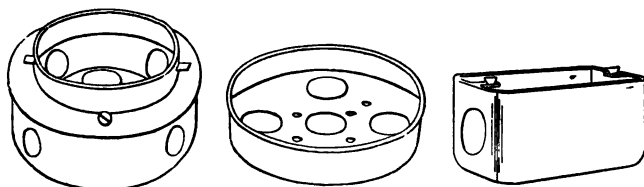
, 105 and 106 — Devices for reinforced concrete buildings.
